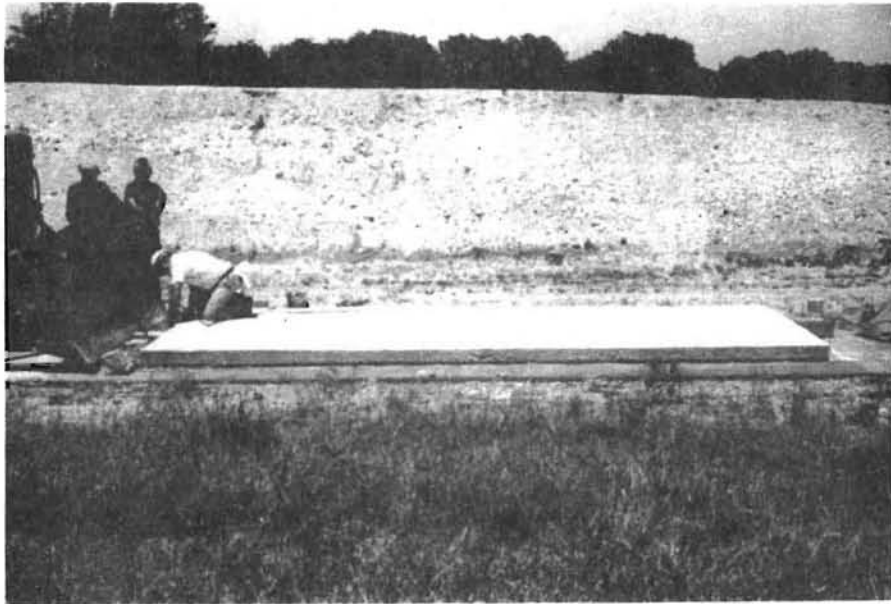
Stressing ram reacting against dozer blade and test slab.
